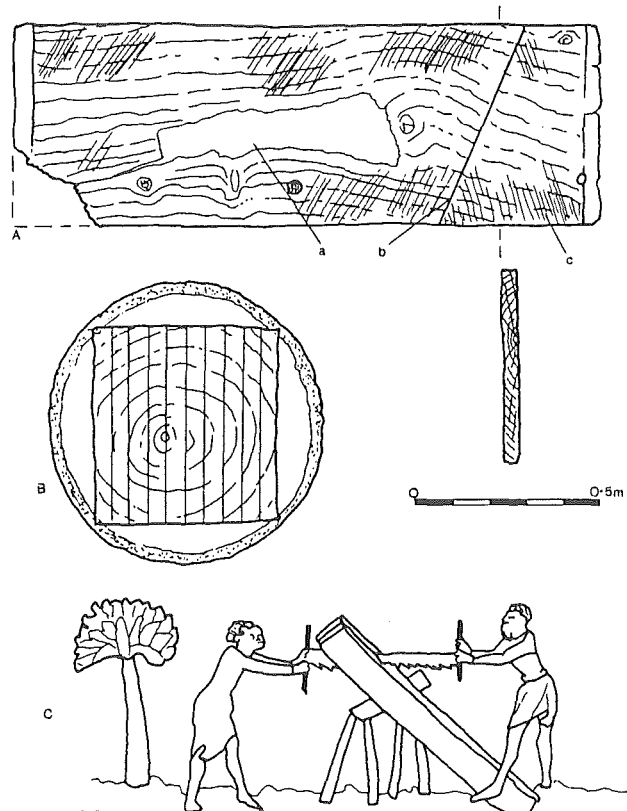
A) A see-sawn oak plank used in a timber river wall of the mid 13th century at Vintners Place, London: a) lost during demolition. b) step of 6mm, where saw cuts joined. c) saw marks. B) The hewn parent saw baulk for the plank. C) 14th century English manuscript illumination, showing see-sawing, after Harvey 1975.
